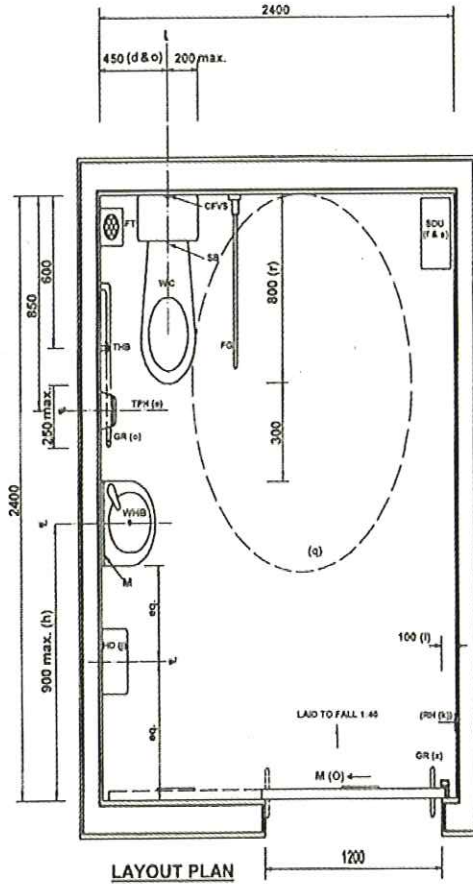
Accessible toilet unit (sliding door) - Layout plan
